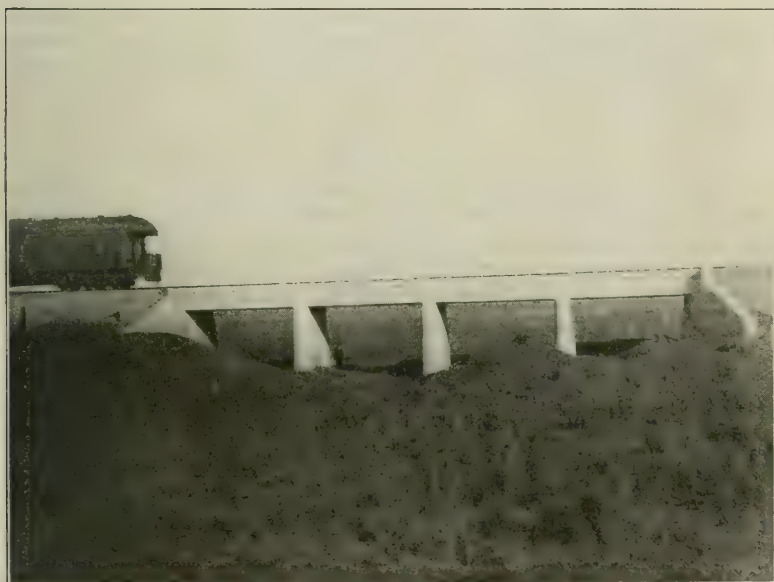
Concrete Trestle on Piers Over 16 Feet High.
